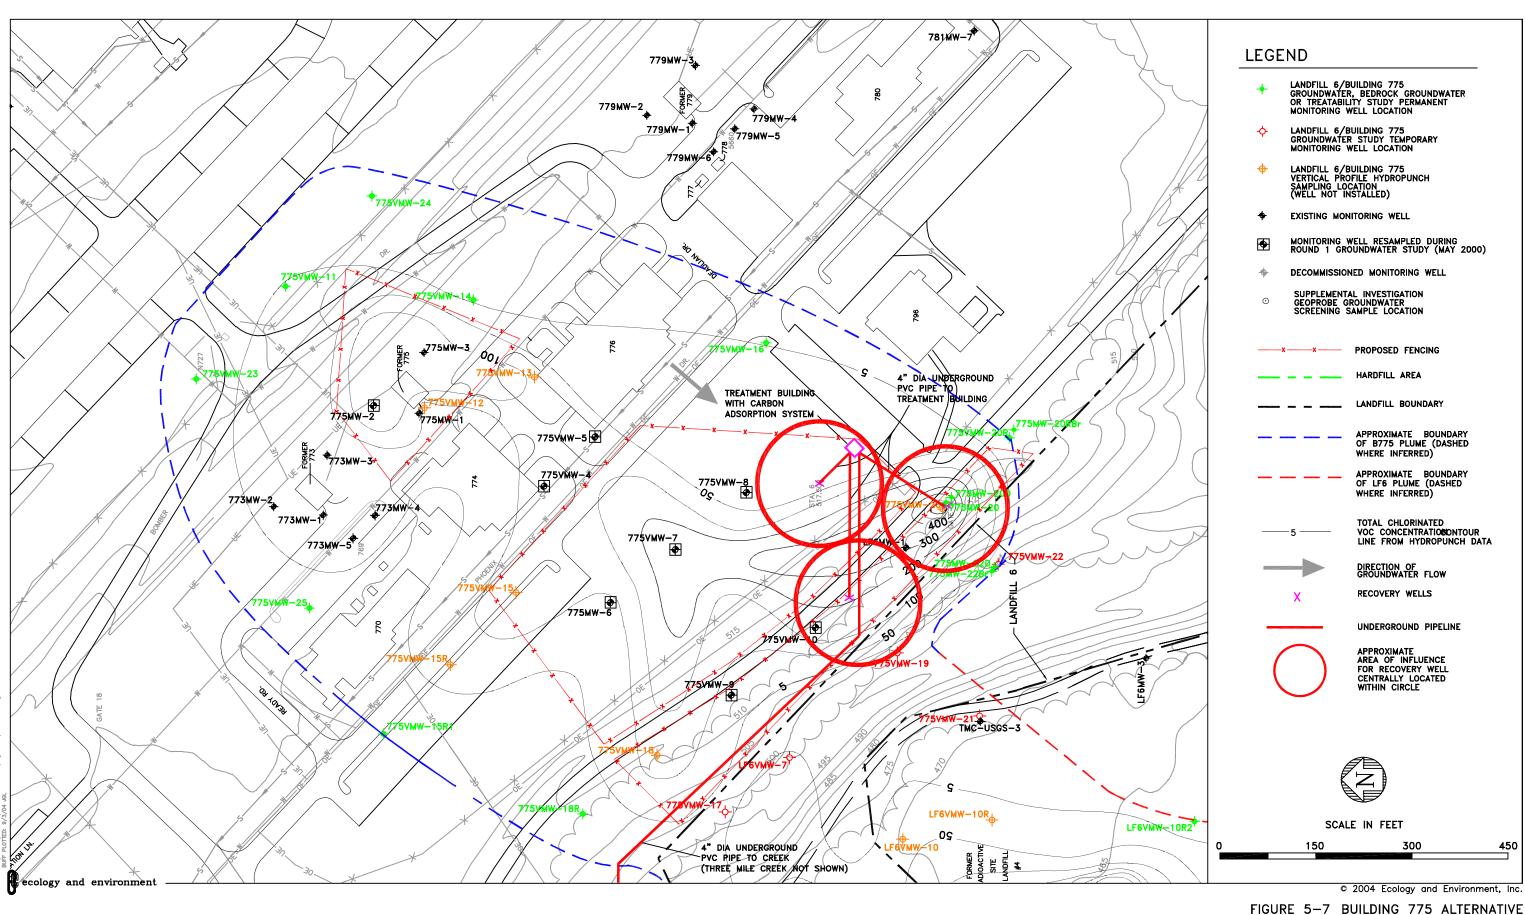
BUILDING 775 ALTERNATIVE 5 EXTRACTION, TREATMENT AND DISPOSAL FORMER GRIFFISS AFB ROME, NEW YORK
